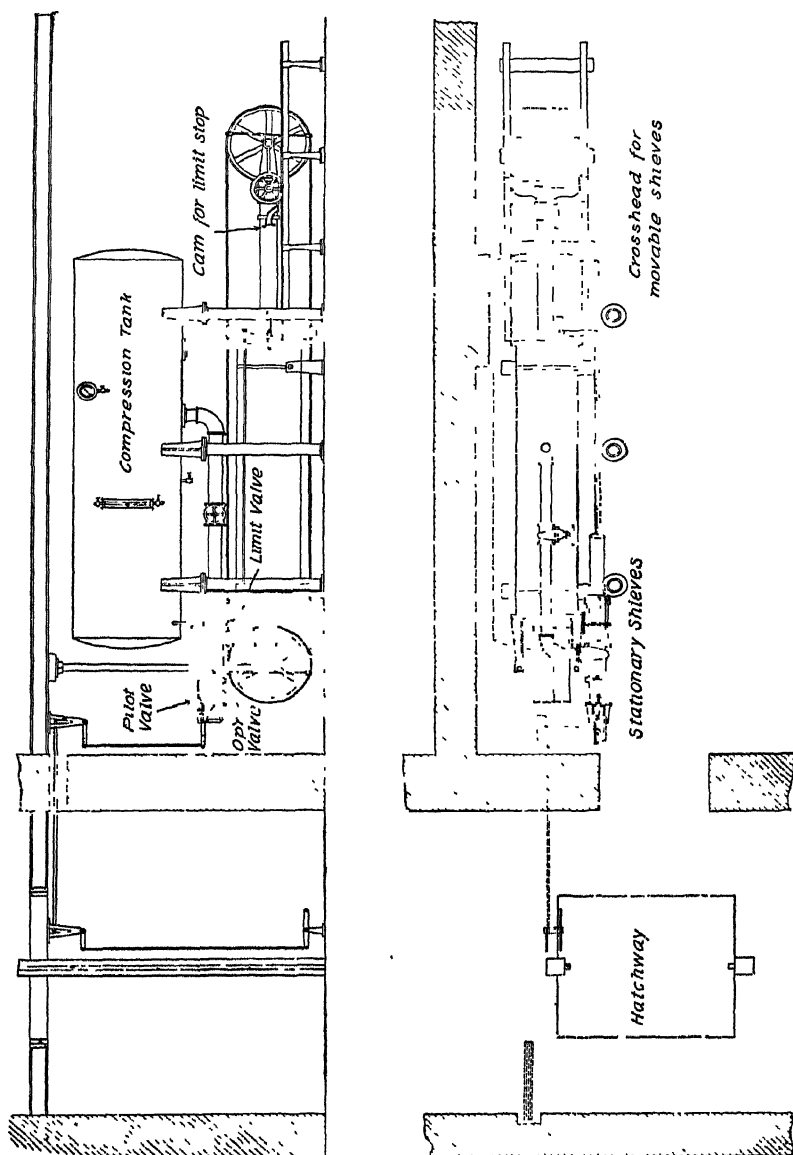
Plan and Elevation of Horizontal Hydraulic Elevator.
